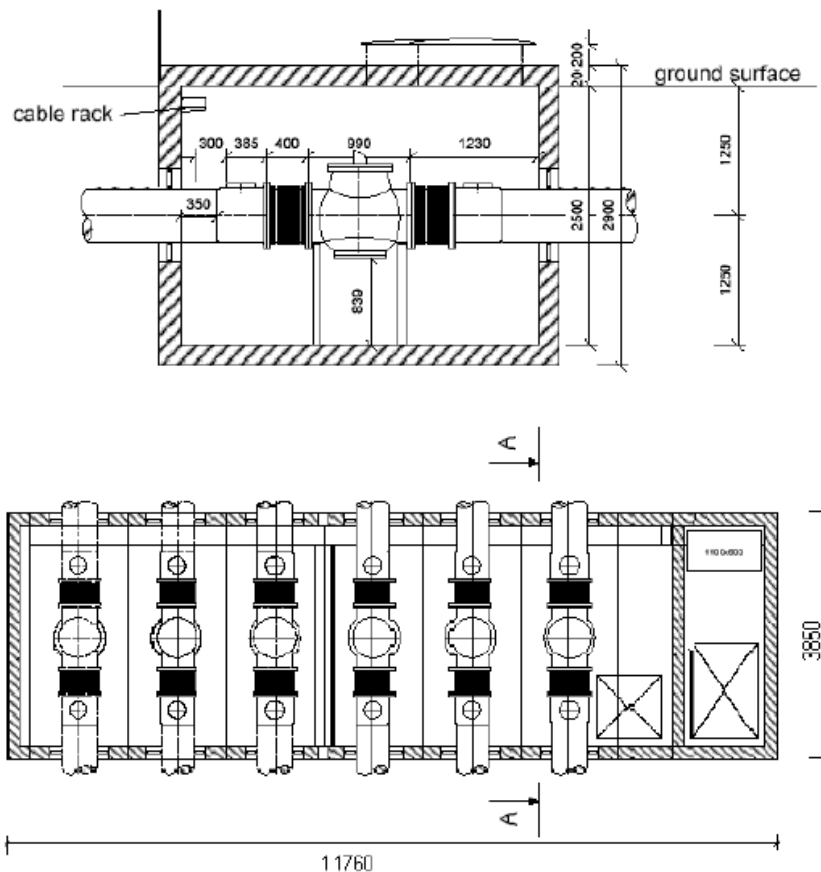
Structure for housing joints of GIL sections (source [Oswald 2007])
